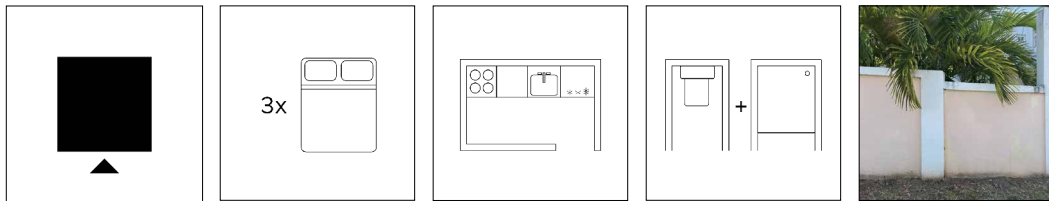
Space Suit: Ranks, and Options. Examples: (a) front access; (b) 3-bedrooms; (c) kitchen; (d) toilet and bathroom; (e) wall fence.
